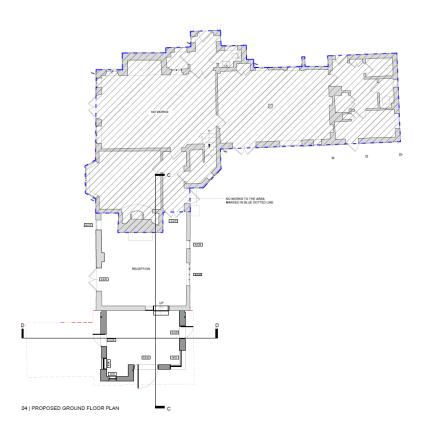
Proposed Ground Floor Plan (Robinson Van Noort, 2023)
